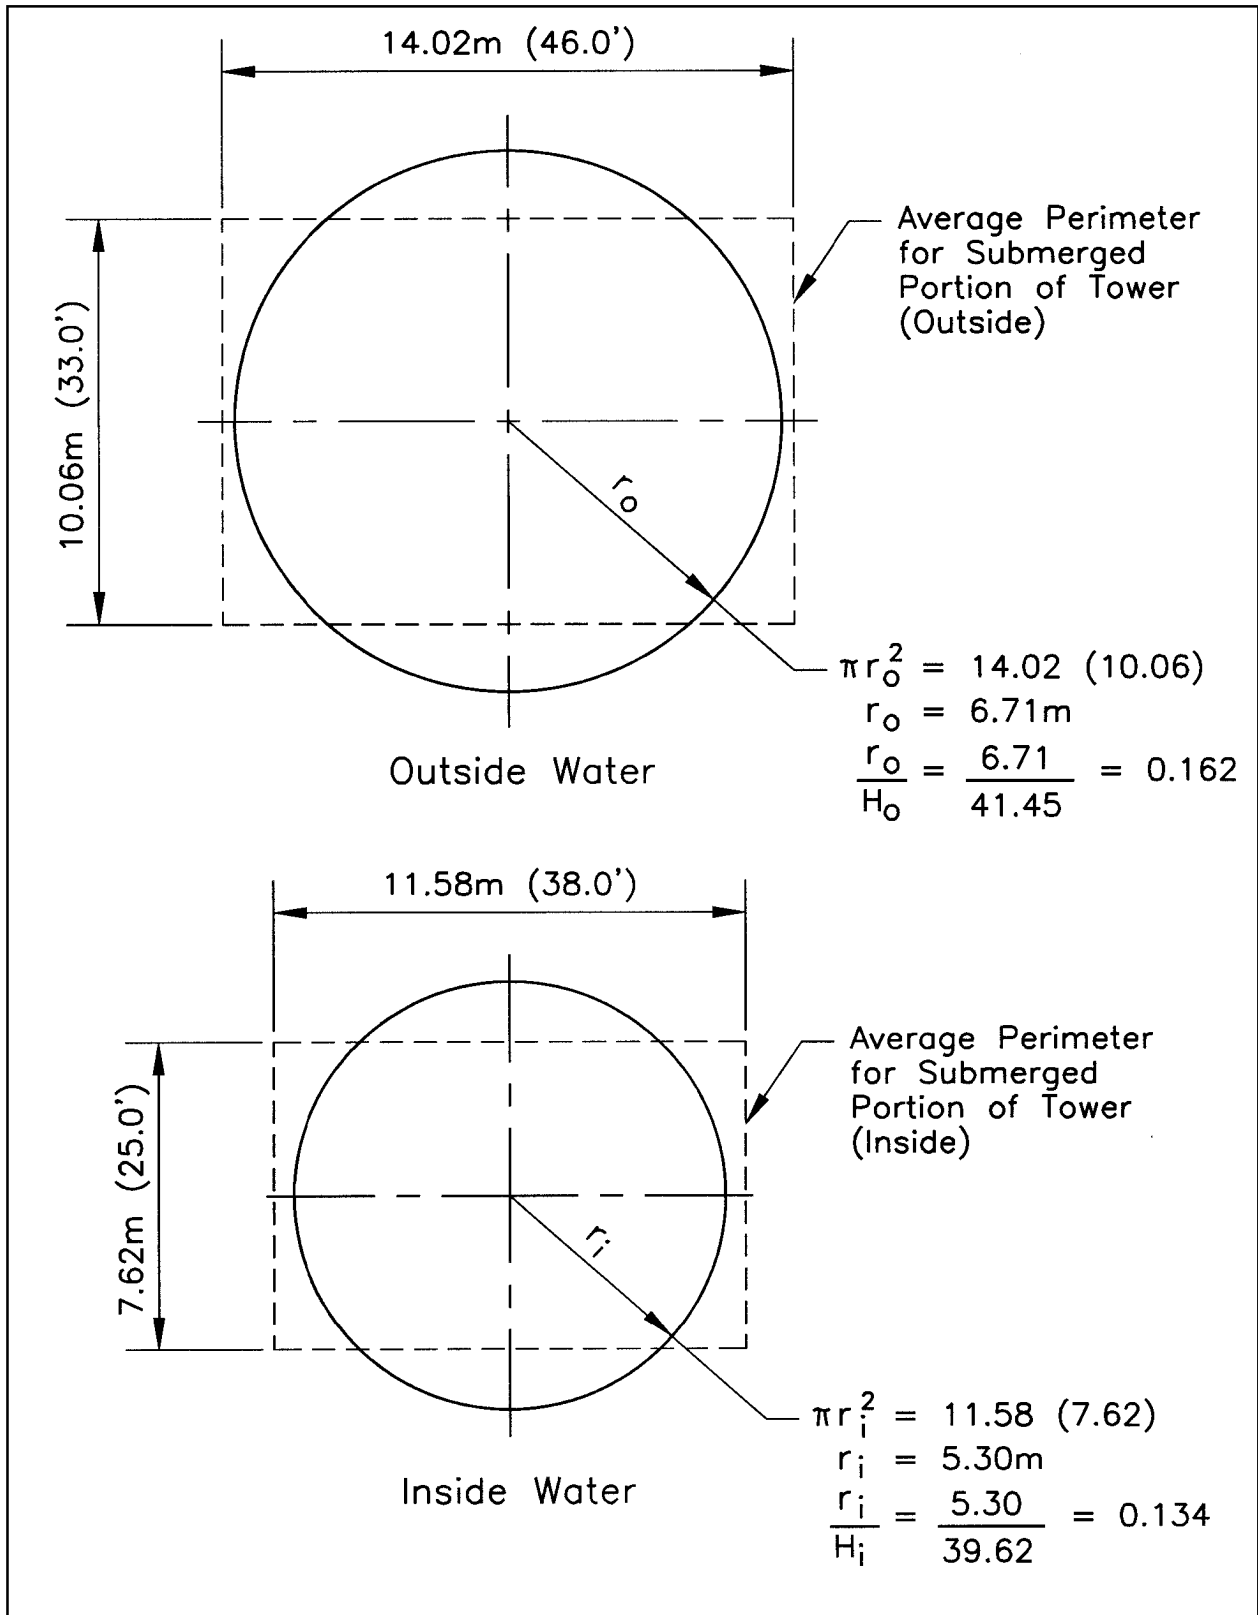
Added hydrodynamic mass, outside and inside water, circular areas equivalent to average tower dimensions
